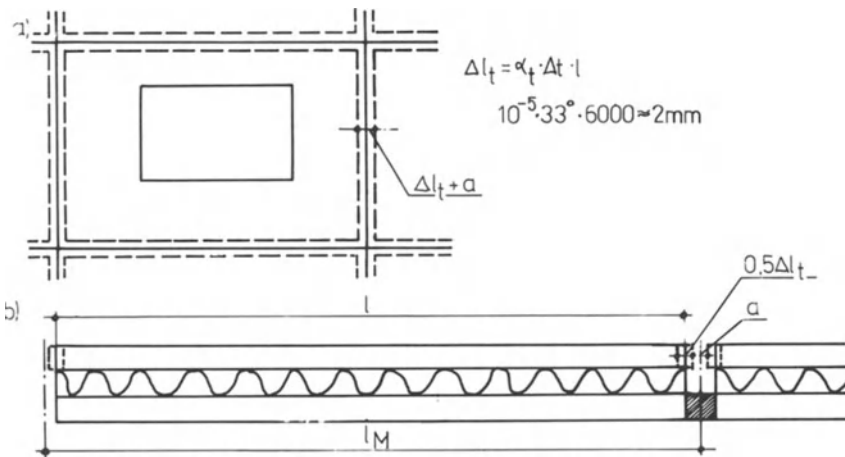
Thermal deformation of joints in an external sandwich panel wall; a. deformation, b. concept of unrestricted expansion and contraction
